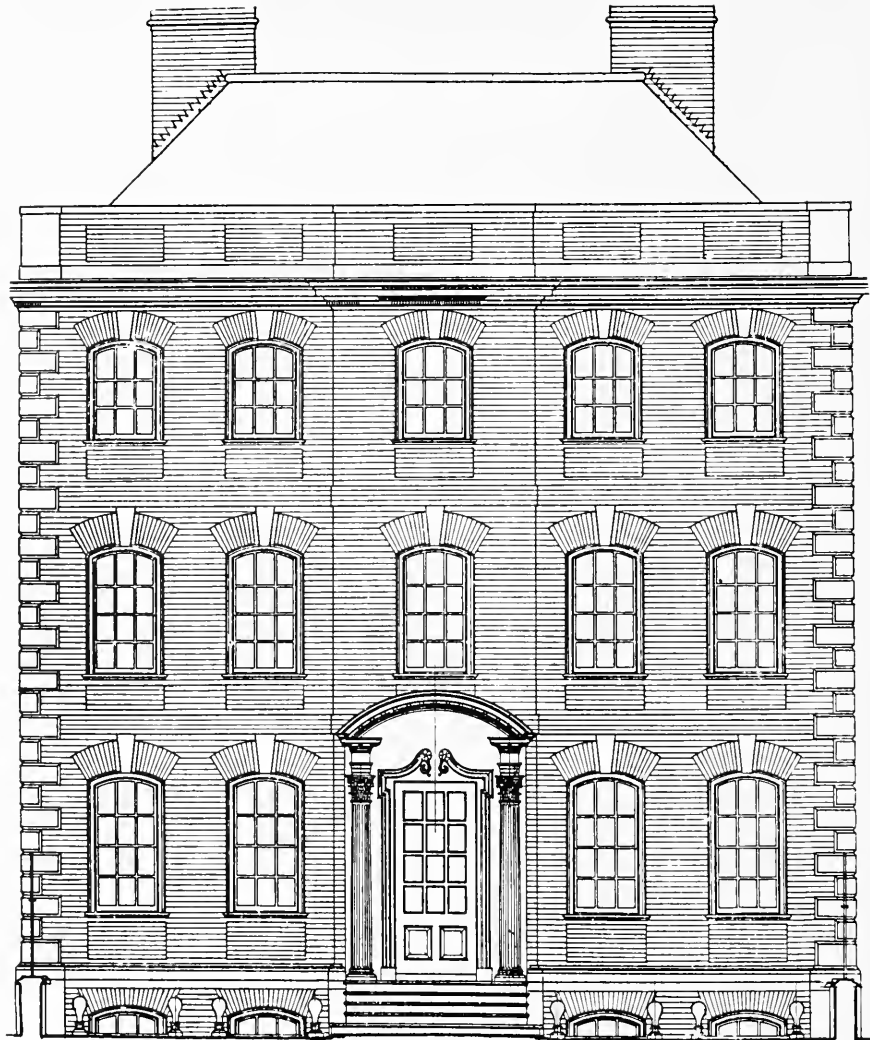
Rainham Hall, front elevation, from Small and Woodbridge, p.120.
